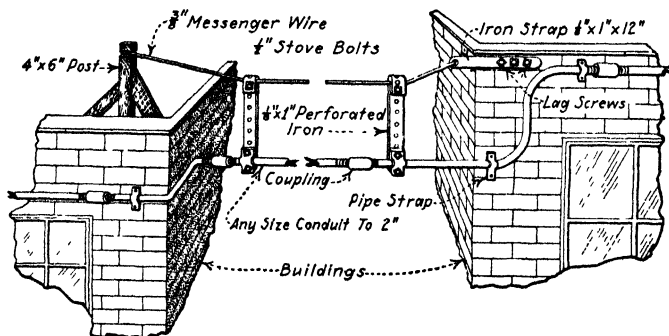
Long conduit span supported by messenger wire and extension bar hangers. The City-Of-Chicago wiring rules provide that every length of conduit must have its own support. The above arrangement satisfies this requirement.
